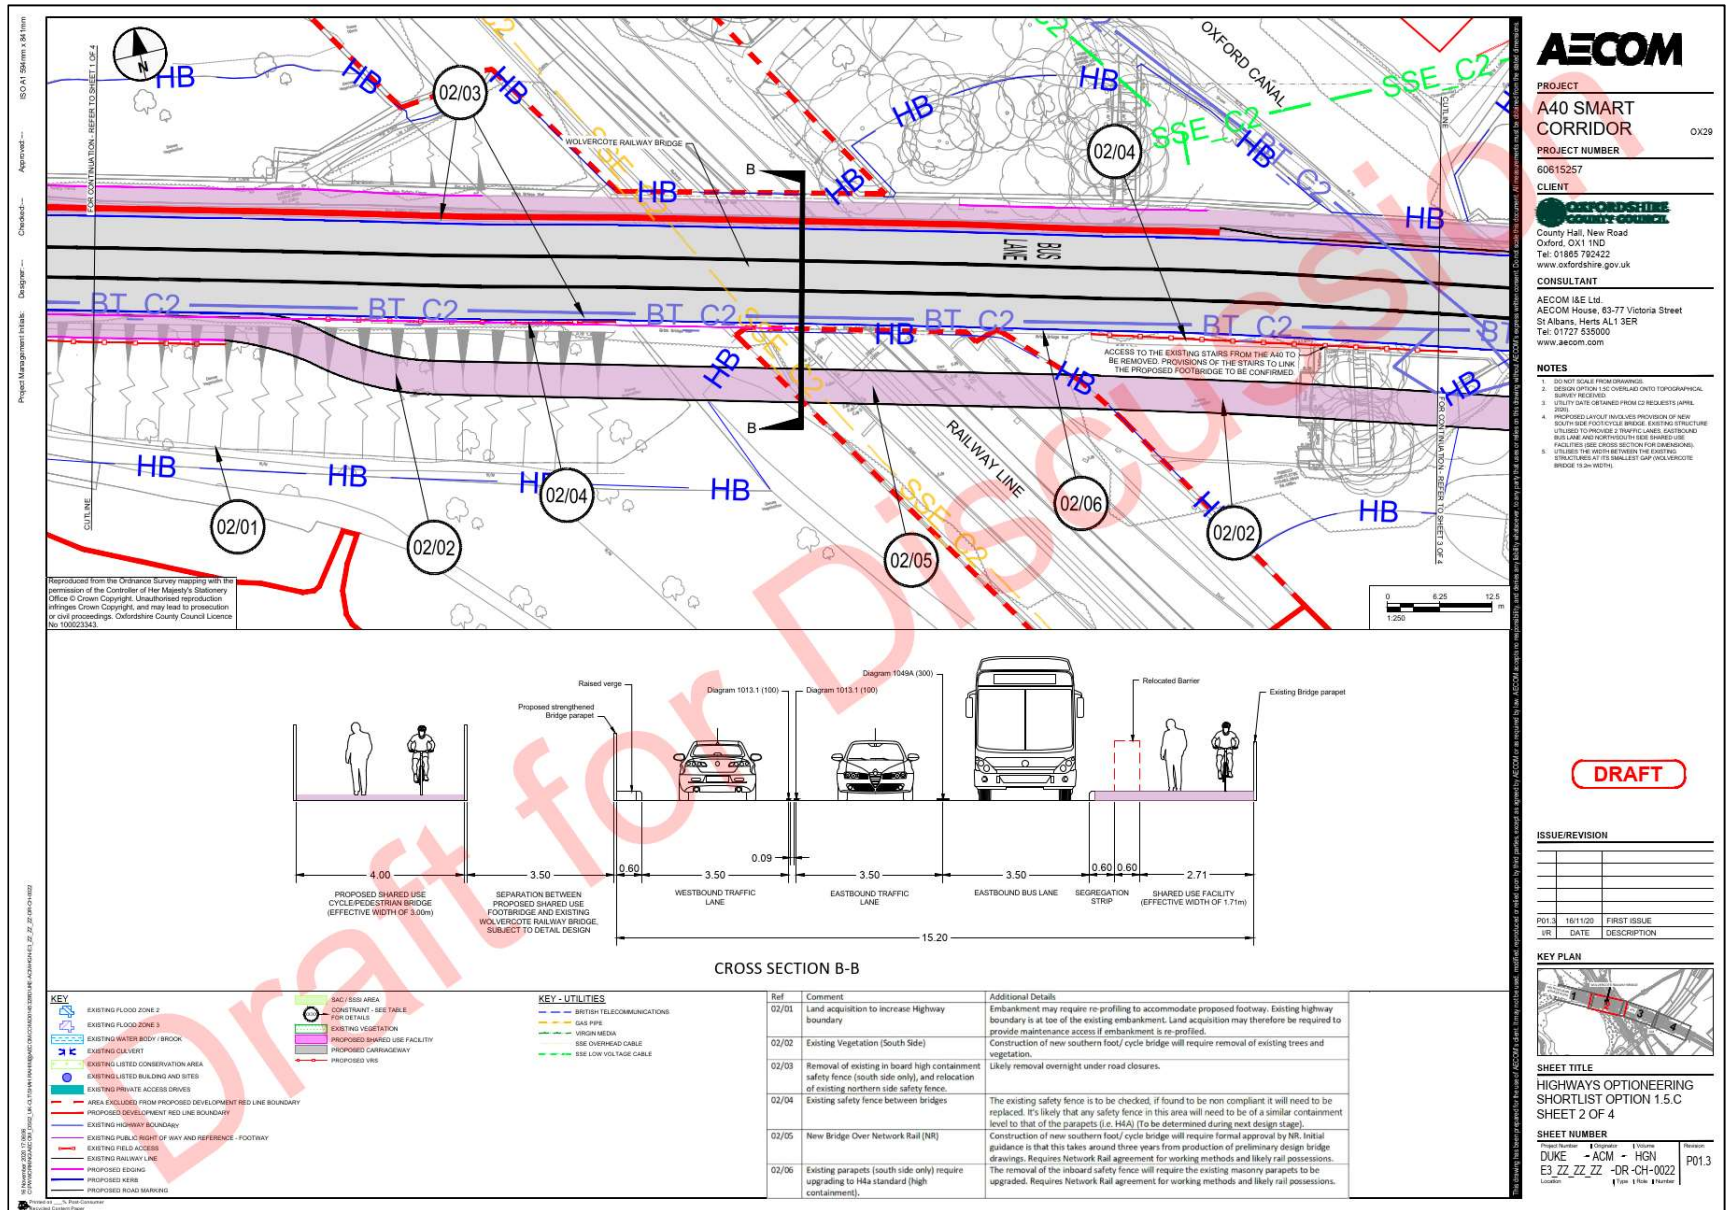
Option 1.5c Cross Section at Wolvercote Bridge
